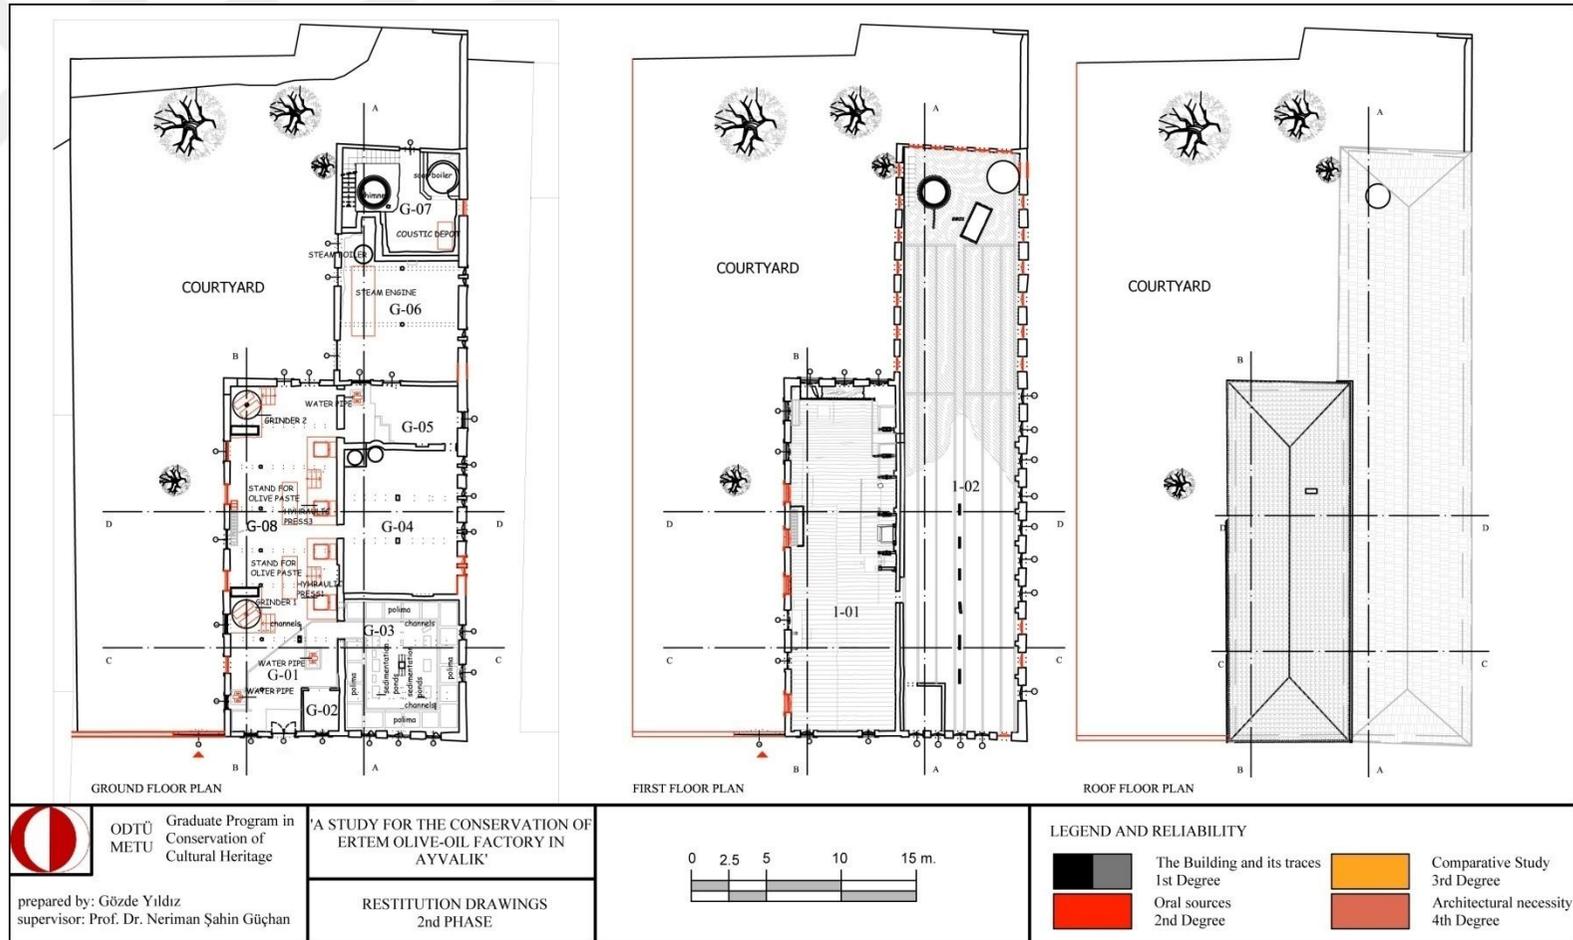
2nd Phase of the Factory, floor plans and roof plan
